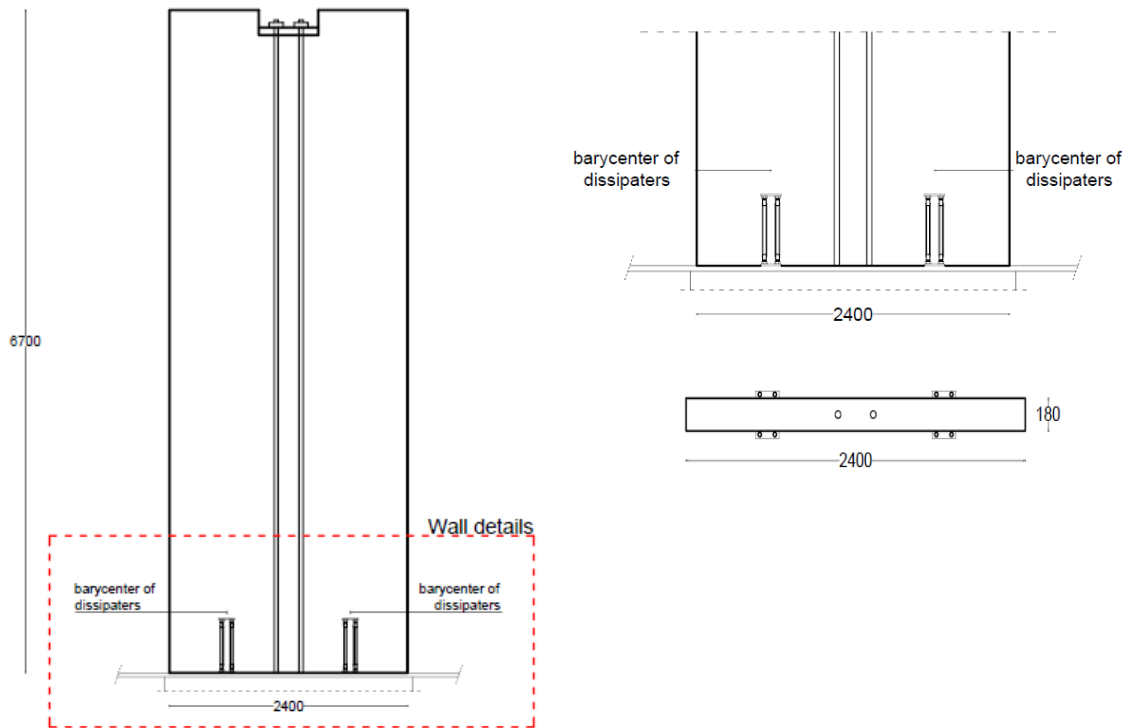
Details of the Wall. Vertical Section of the Wall (left), Detail of the base of the Wall (top right), Horizontal Section of the Wall (bottom right)
